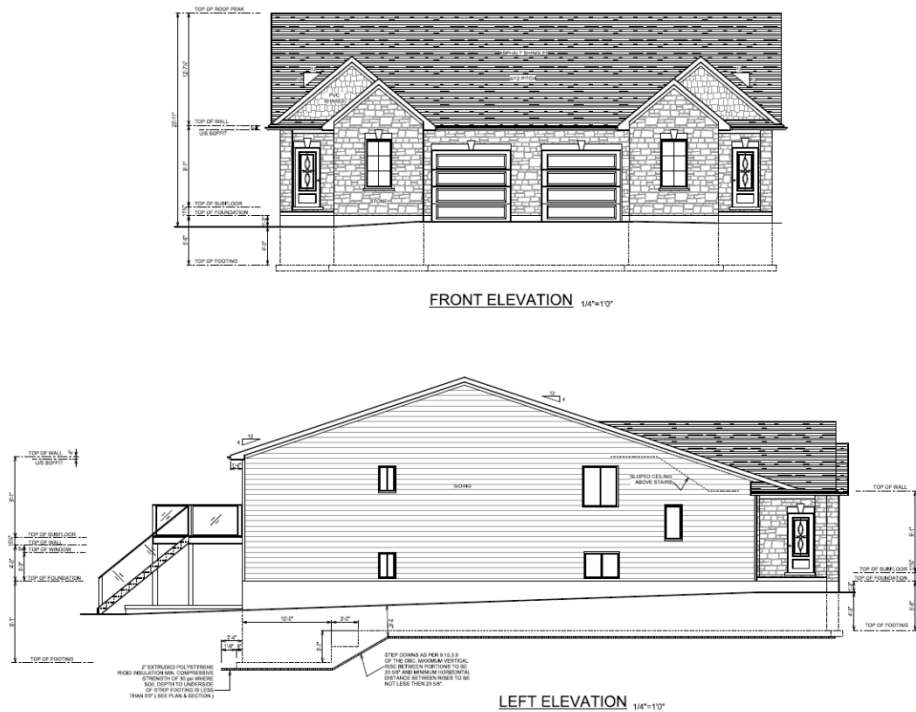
Excerpted Elevations - Semi-Detached Dwellings with ARUs.
